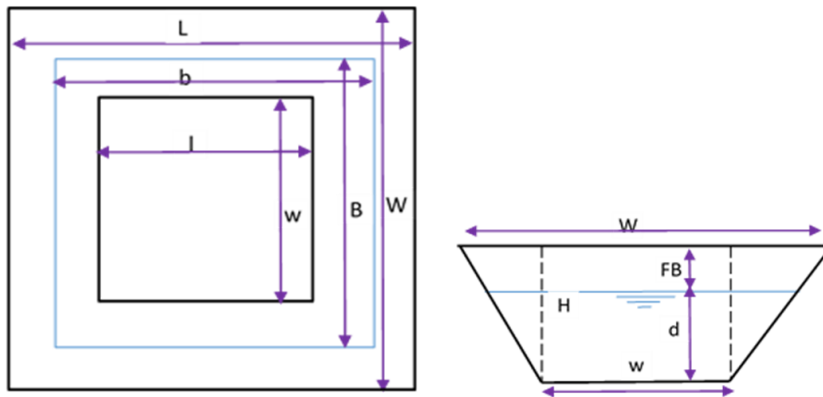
5 Plan and section of Trapezoidal Reservoir
